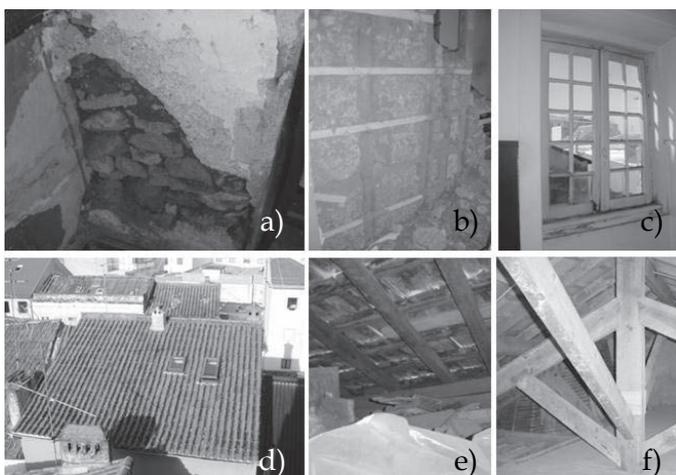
Building characteristics: a) interior wall, *frontais*; b) interior wall, *tabique*; c) wooden window; d) roof with ceramic tiles; and e) and f) wooden roof structure.
